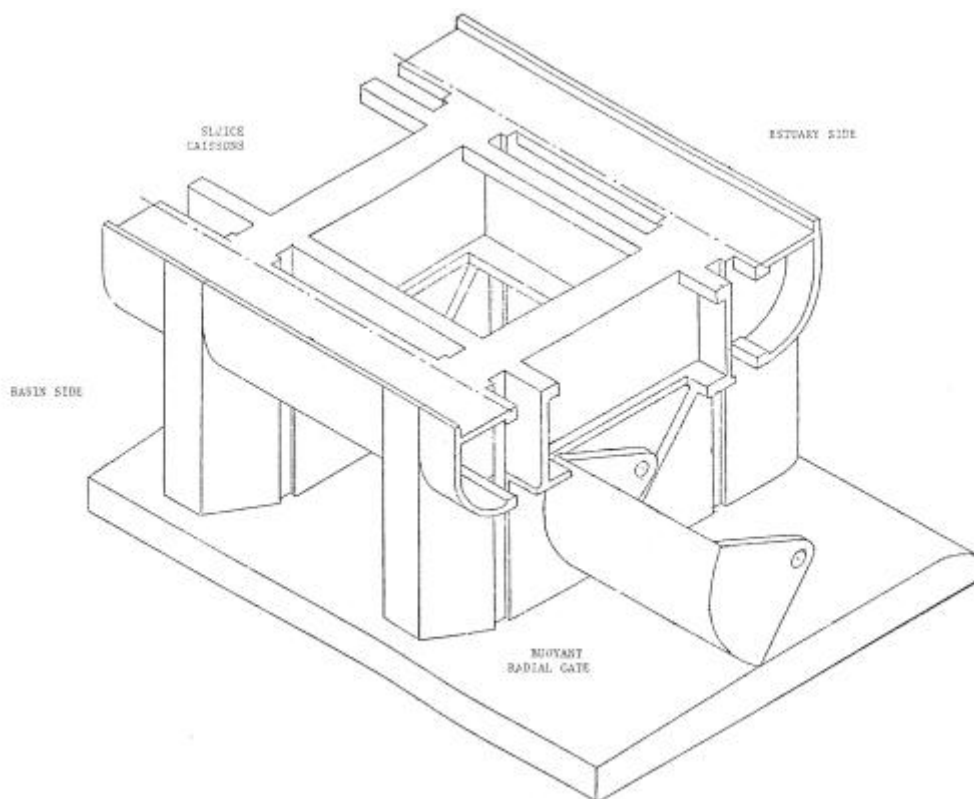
(4): Isometric view of sluice caisson for Cardiff-Weston barrage
